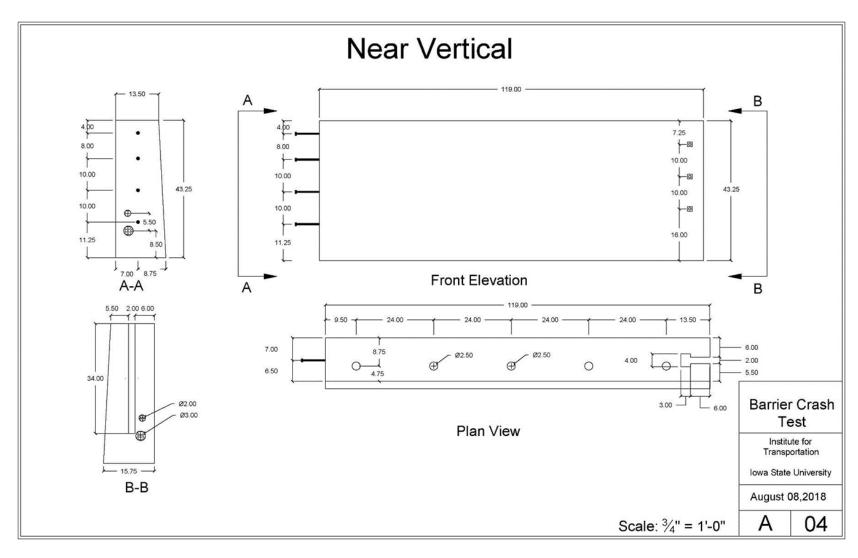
Near-Vertical Barrier Segment, Dimensions in Inches [5]
